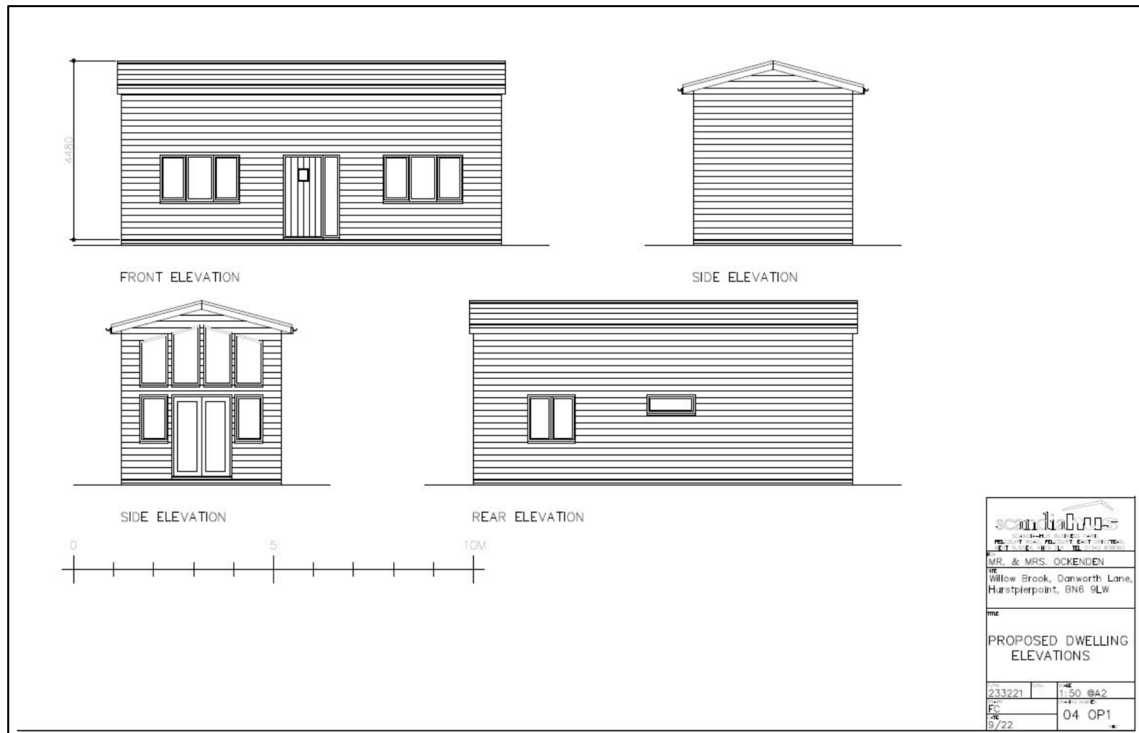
The proposed elevations of Willowbrook, Danworth Lane, Hurstpierpoint, Hassocks.
